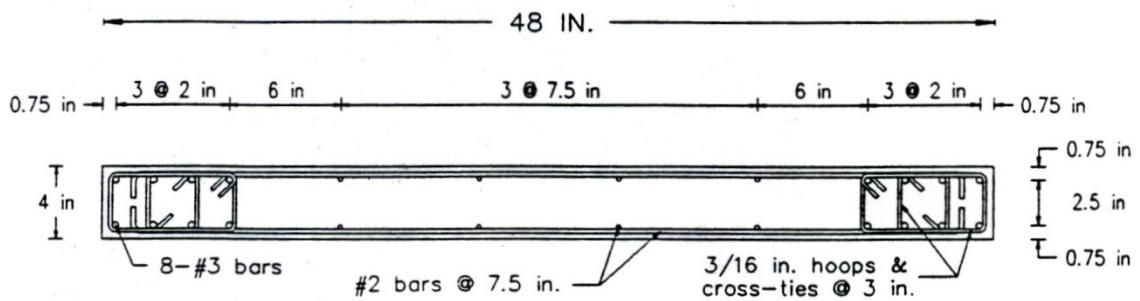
Section of Rectangular Wall RW1 Tested by Thomsen and Wallace (1995)
